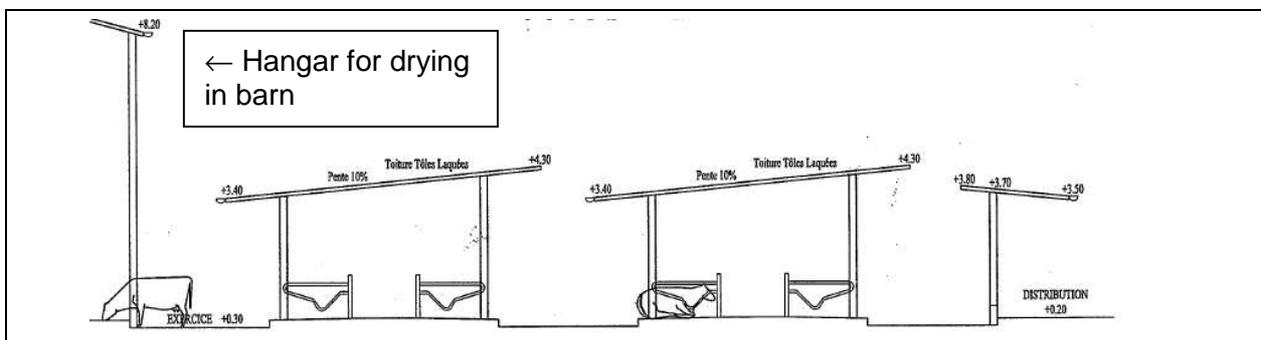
Sectional view of building at Farm 53-A (Agriculture Bureau 53)
